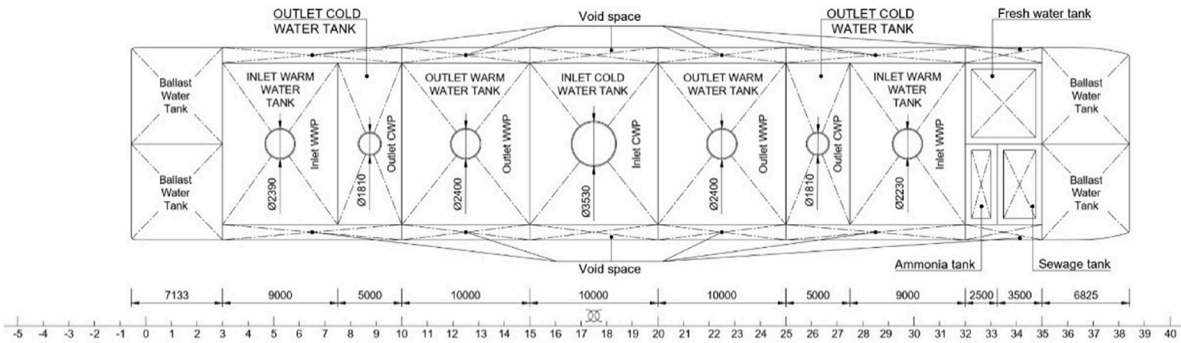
Plan View Prototype Floating Barge OTEC 1500 mm.
